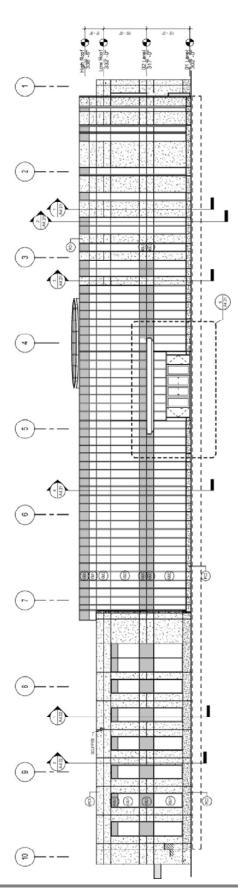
Canopy Section and Enlarged Elevation (NTS)
